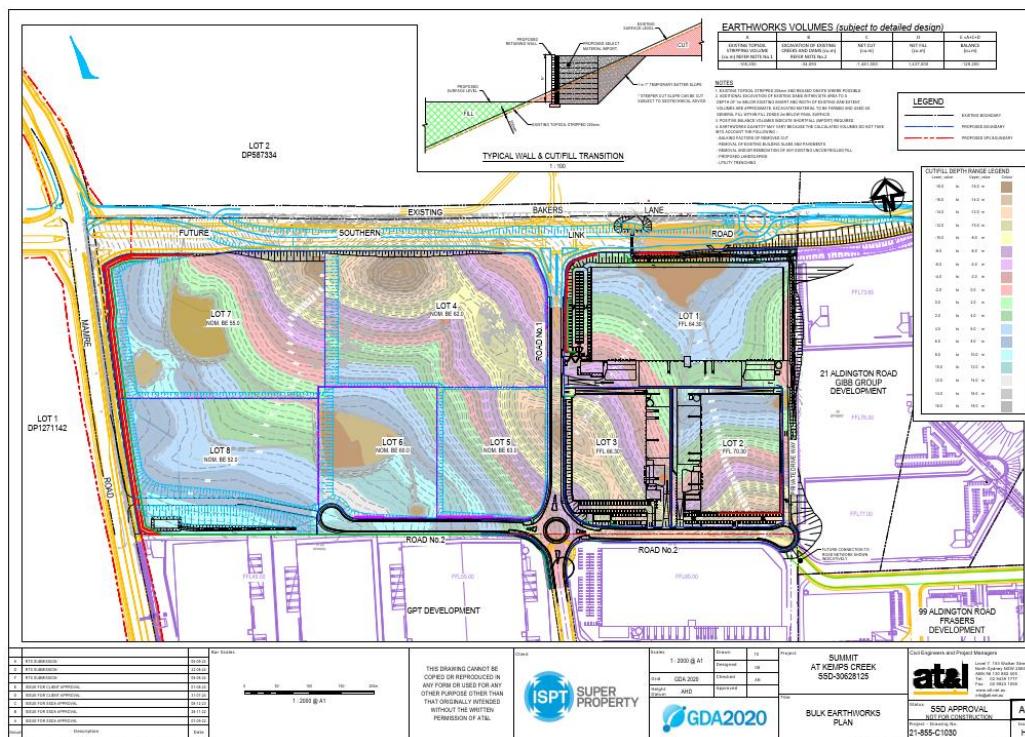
Bulk Earthworks Plan for Summit at Kemps Creek development (AT&L, September 2024)
